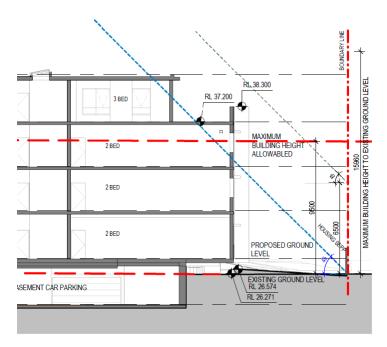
Section of Building D showing Housing SEPP building envelope plane in blue from rear boundary (Source: Group GSA)
